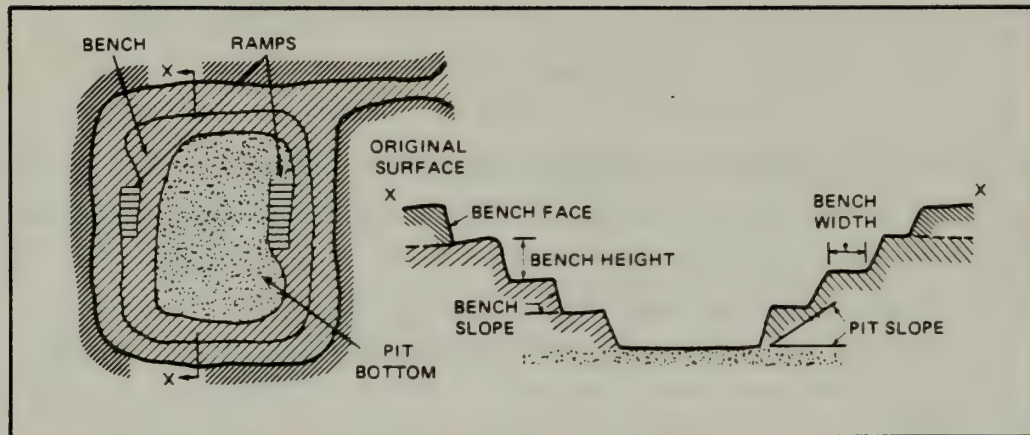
A TYPICAL OPEN-PIT MINE
